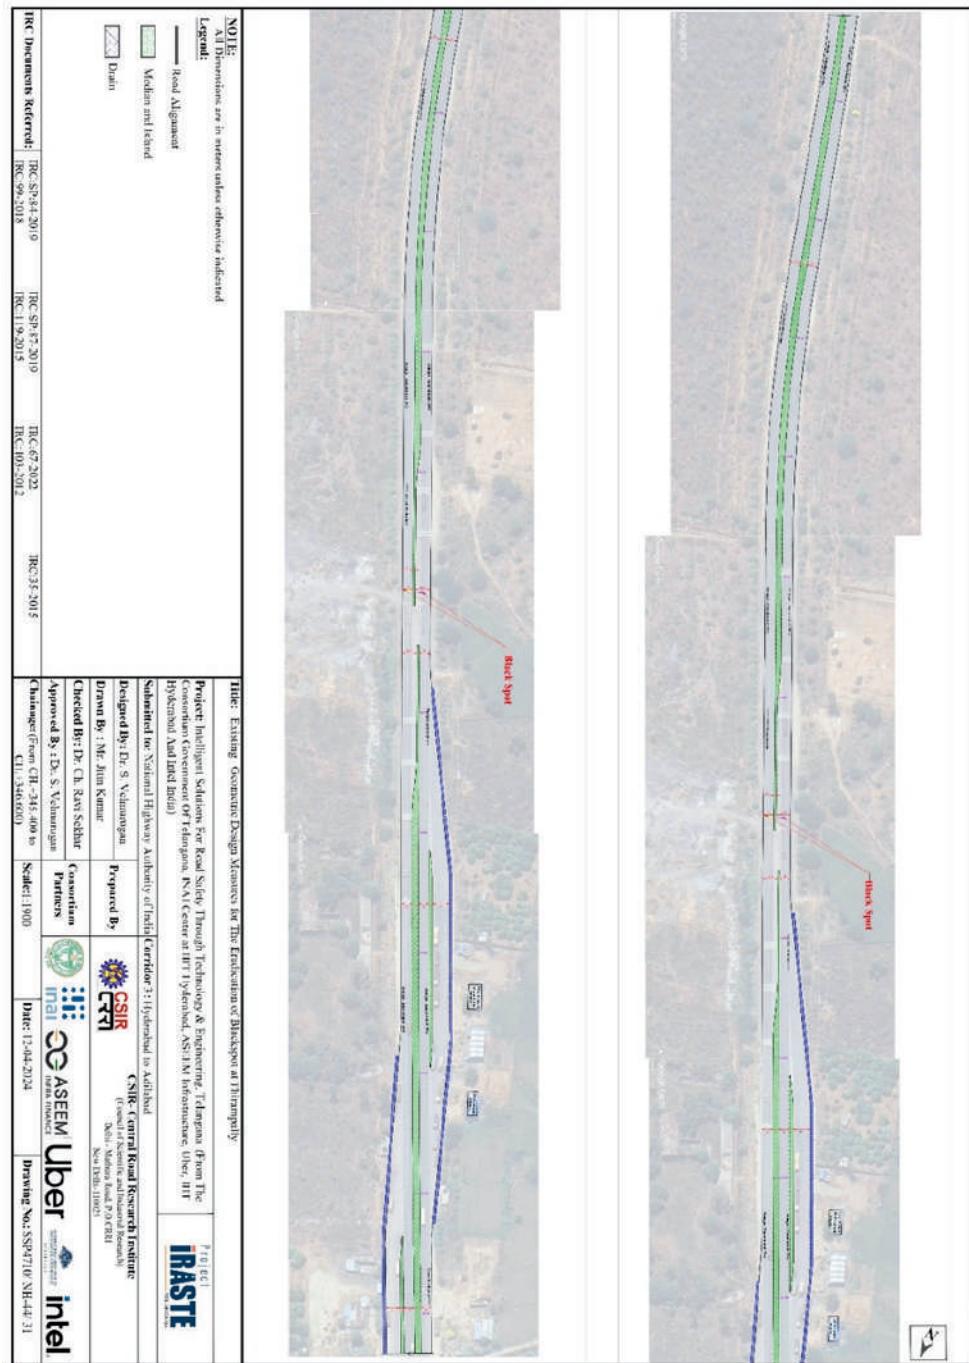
Physical Survey Plan of THIRAMPALLY - Existing
